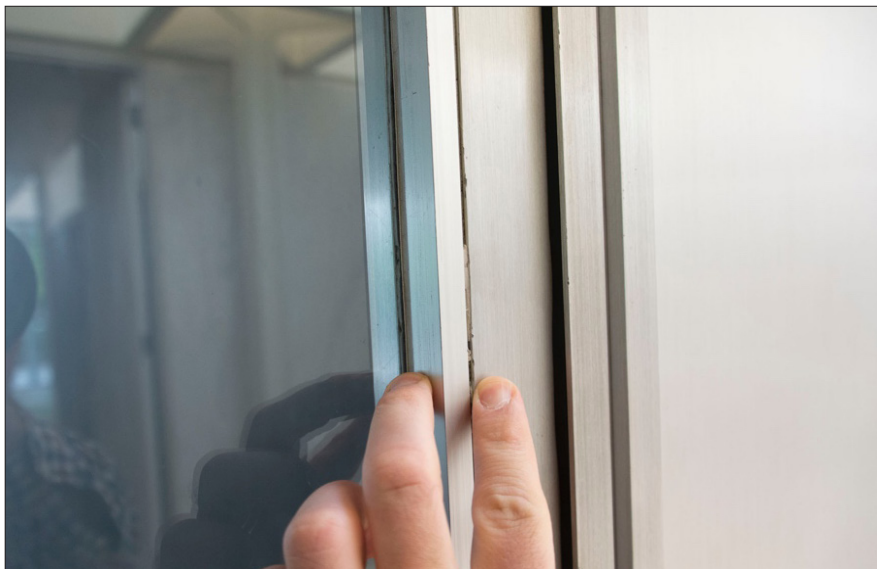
Sealant at all points in the glazing assemblies was typically failing. Date: June 2021. Photo credit: Building Conservation Associates
